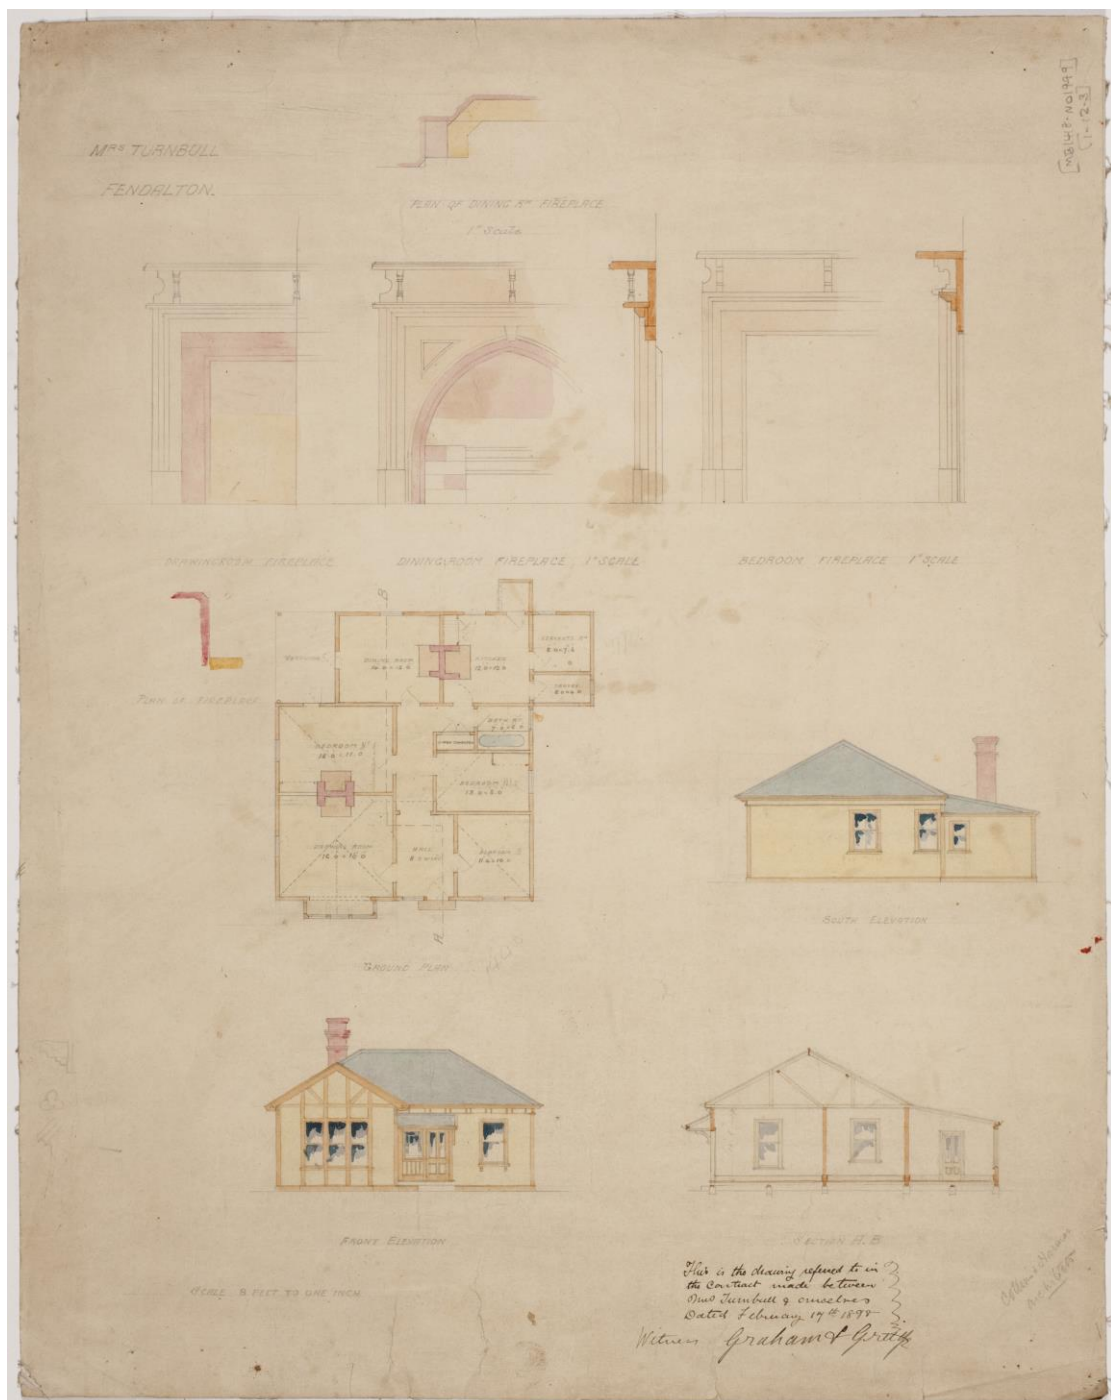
Collins and Harman, Mrs Turnbull, Fendalton, plan, elevations, section and details (1898).
